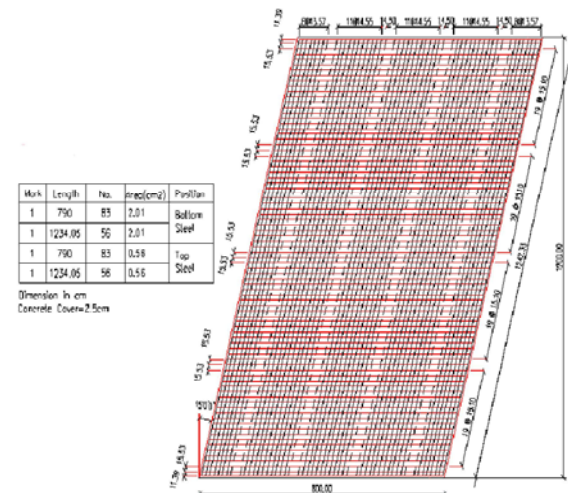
Longitudinal and transverse steel reinforcement of bridge deck in model No. 2.
